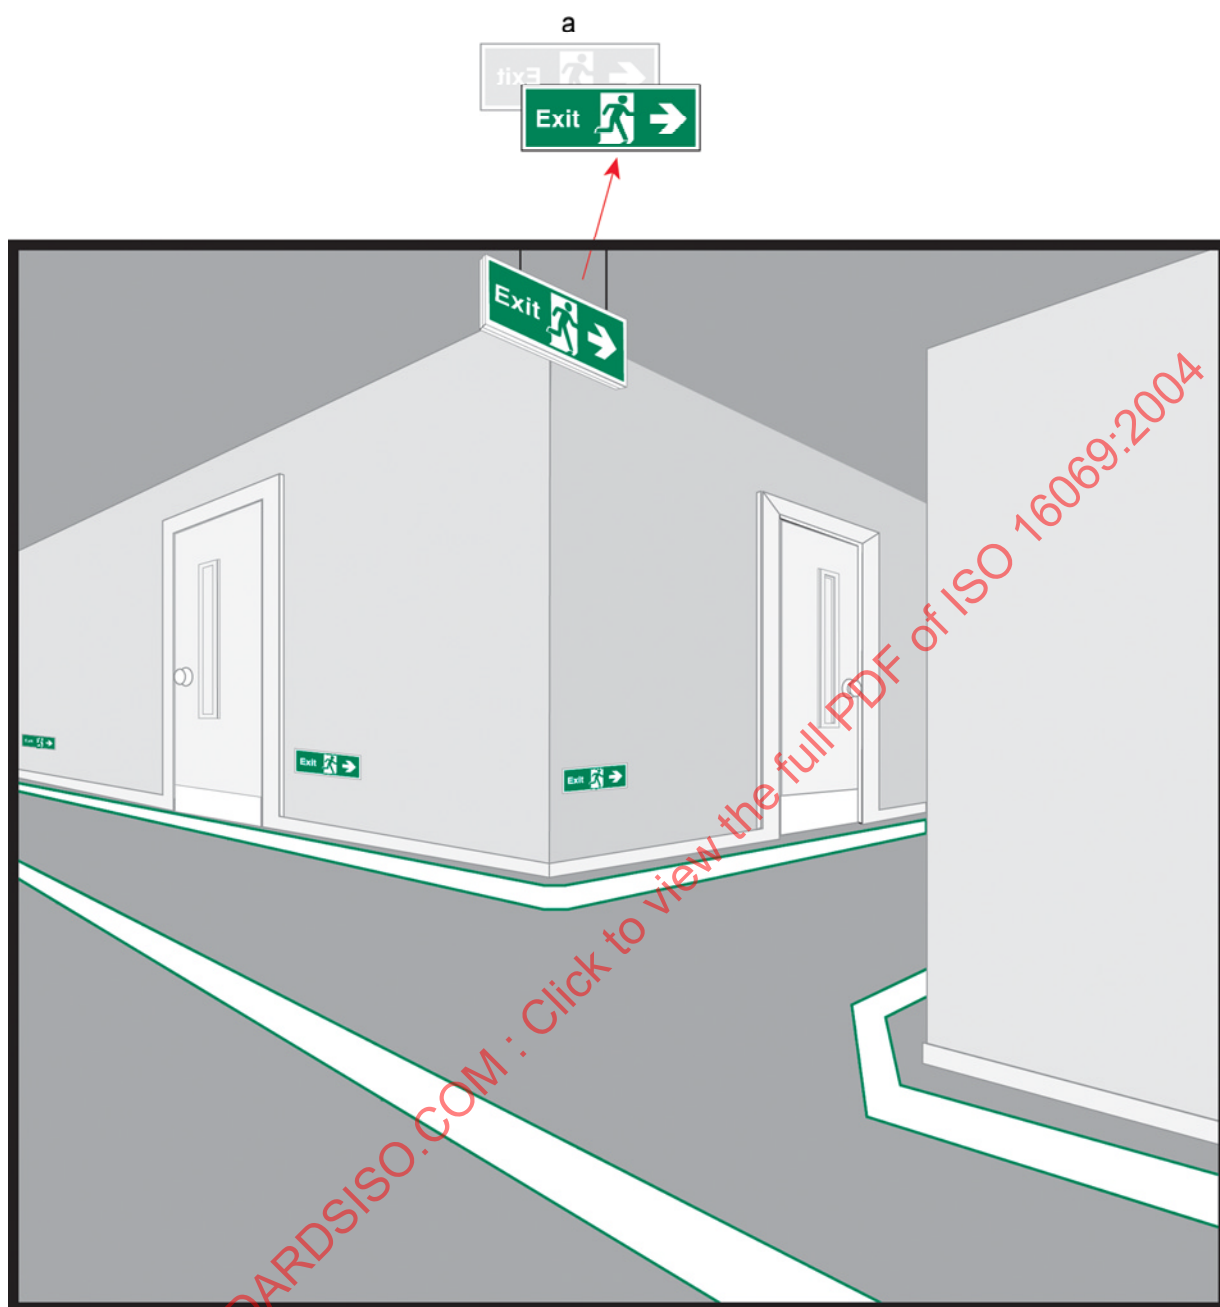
Example layout of an alternative building feature marking and full frame door marking
